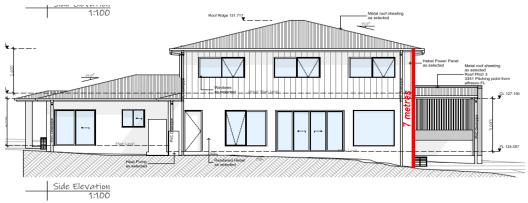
Extract from DA plans (with Trapeze calculation for wall height)
